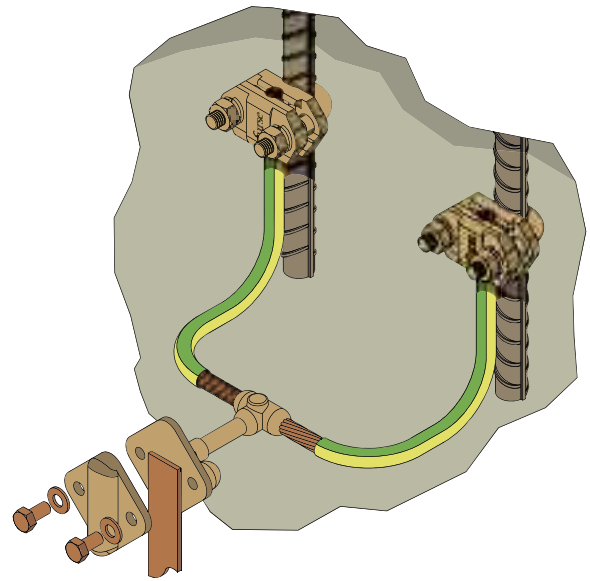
Typical methods of bonding to steel reinforcement within concrete
